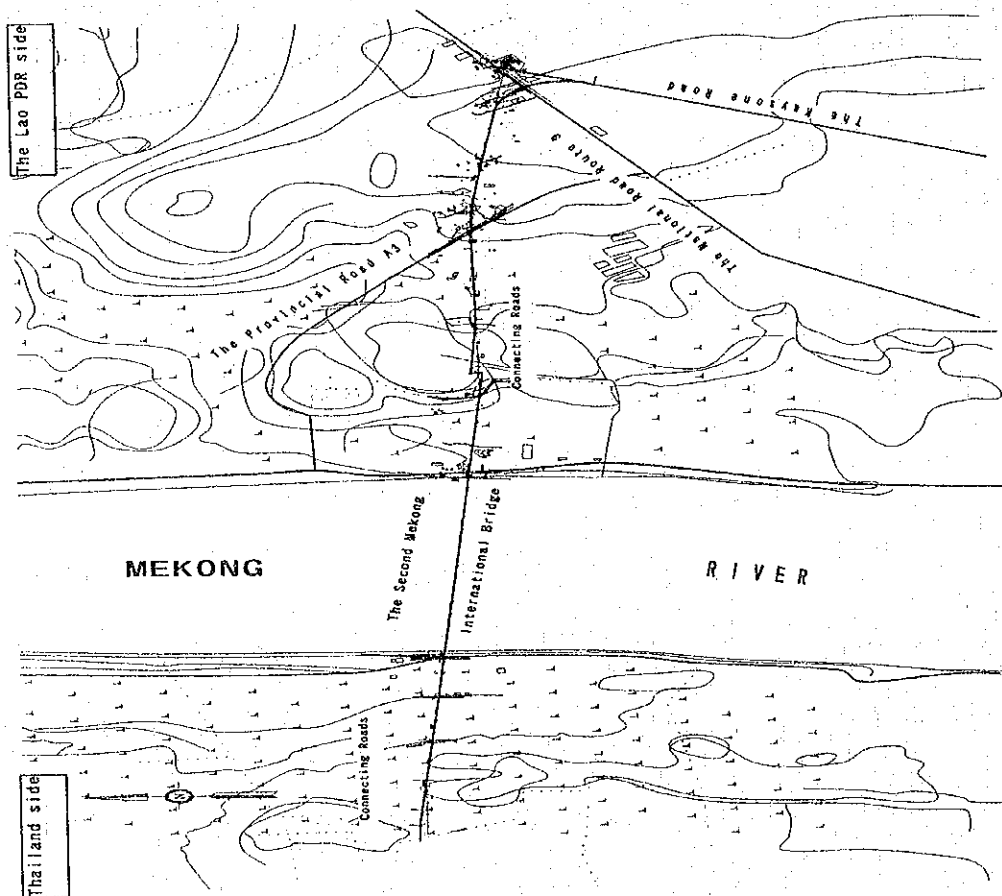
Horizontal Alignment of the Bridge and Connecting Road
